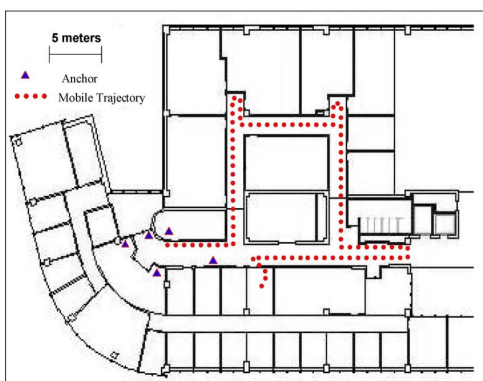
Floor-plan [17] of 4th floor, Durham Hall, Virginia Tech.
